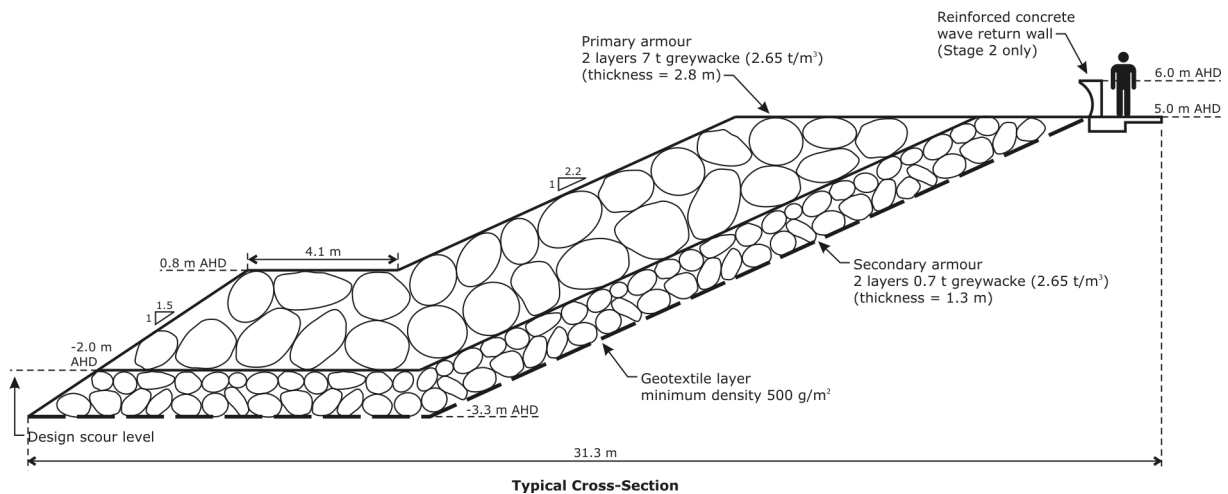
Rock Seawall Design 2 (Design Scour Level -2 m AHD, No Beach Nourishment)
